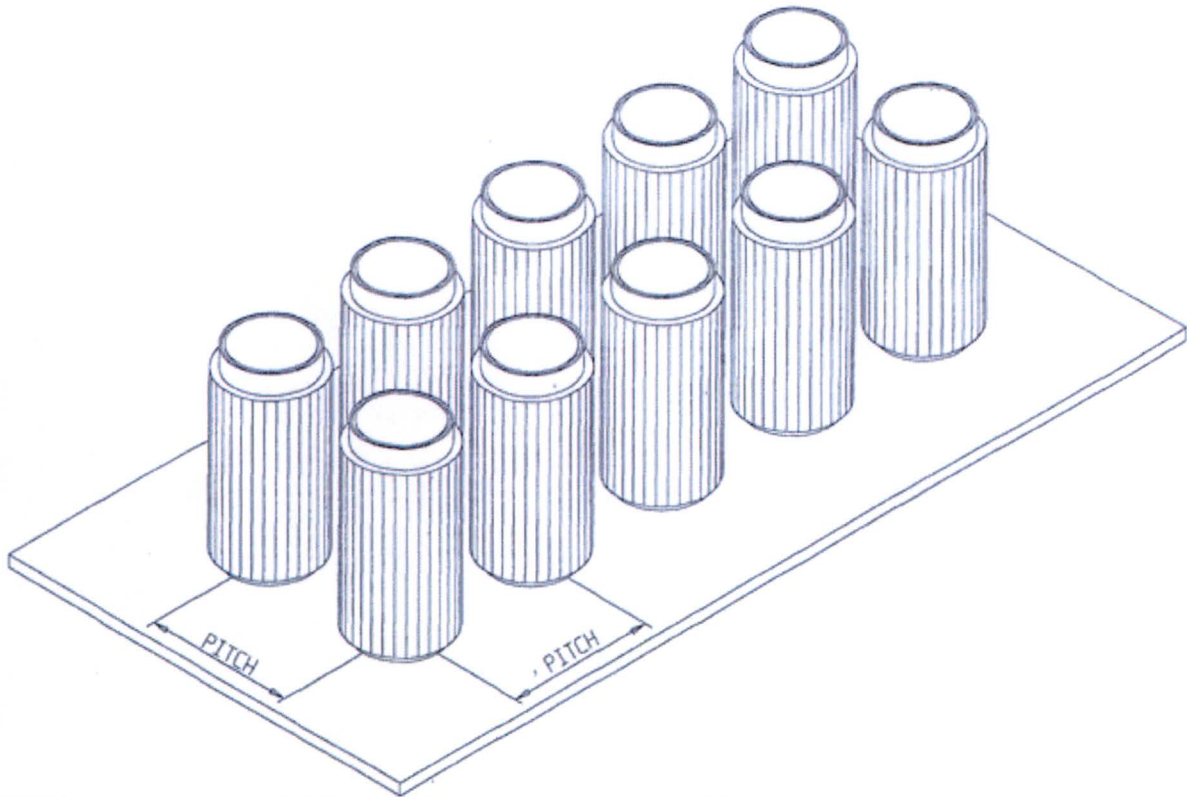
; HI-STAR 100 TYPICAL ISFSI STORAGE PATTERN FOR VERTICAL STORAGE
